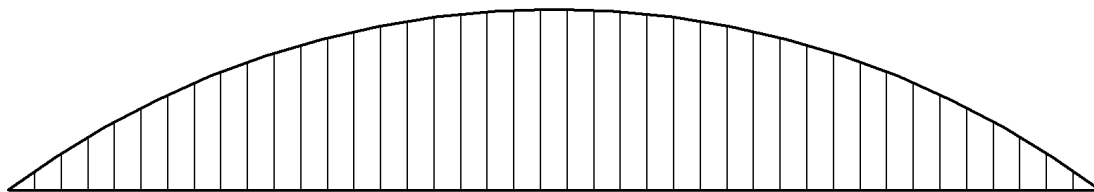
Arch rise of 17 m, span of 100 m and 40 hangers
